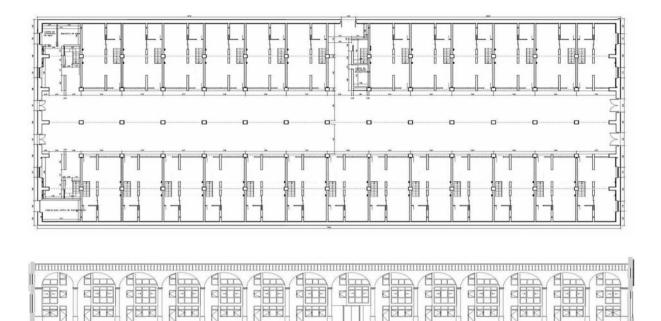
Floor plan and logitudinal section of the converted bodega on 2, Lechugas st (Sánchez, 2014, 52)
